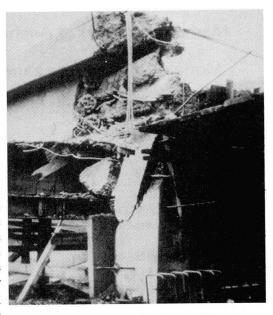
Failure of an Anchorage Zone in a Pedestrian Bridge during Construction
